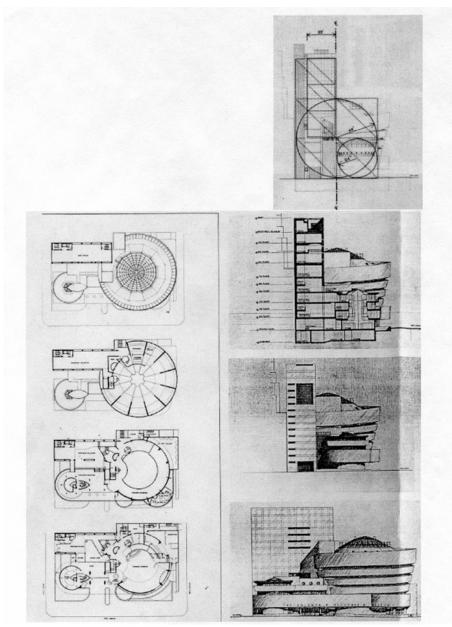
Plans, Sections, Elevation, Diagram of Guggenheim
